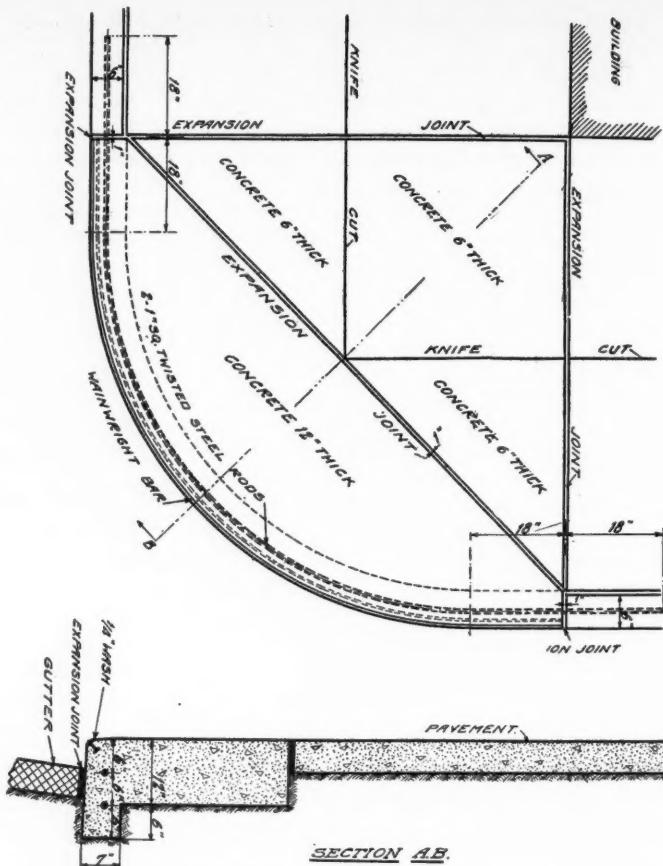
SUCCESSFUL CONCRETE CORNER.
